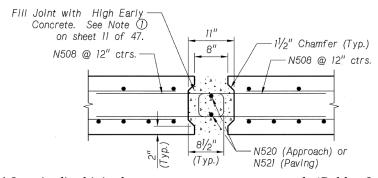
Longitudinal joint between precast concrete panels (Belden-Laurel Bridge)
